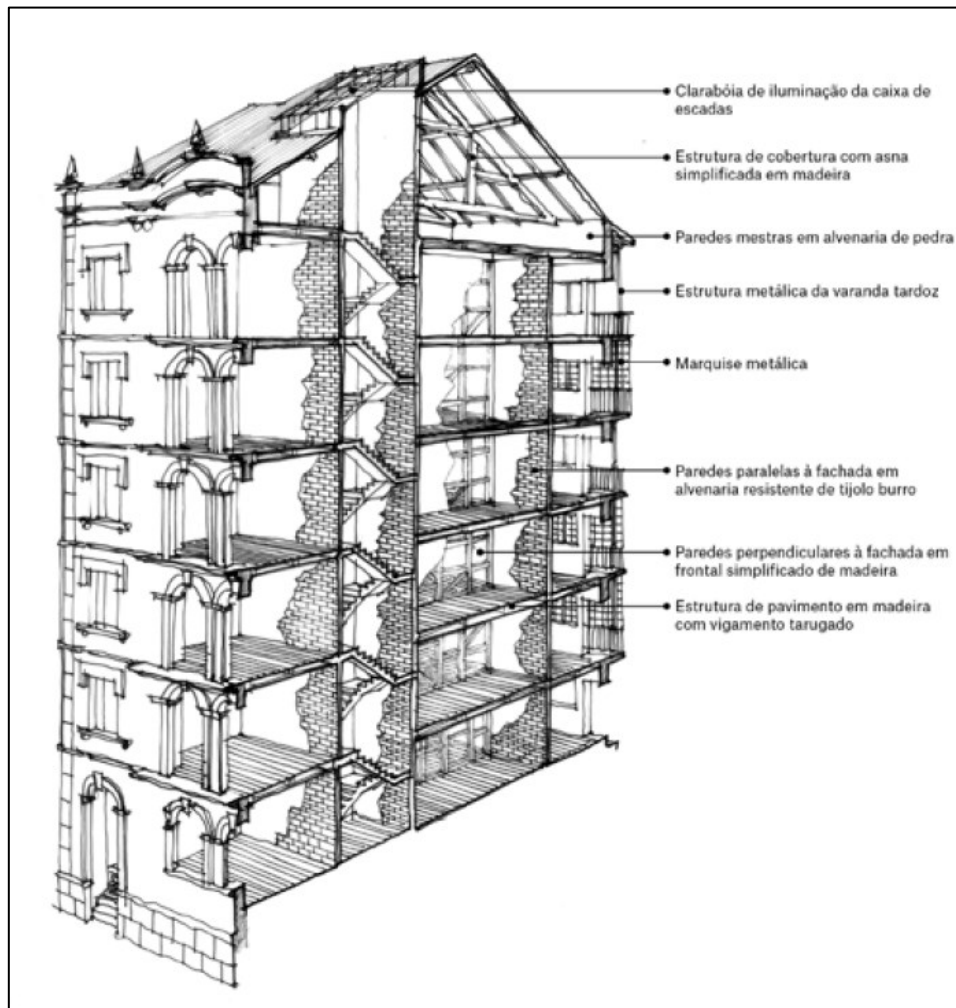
Typical Gaioleiro Building (O.A., 2016)
